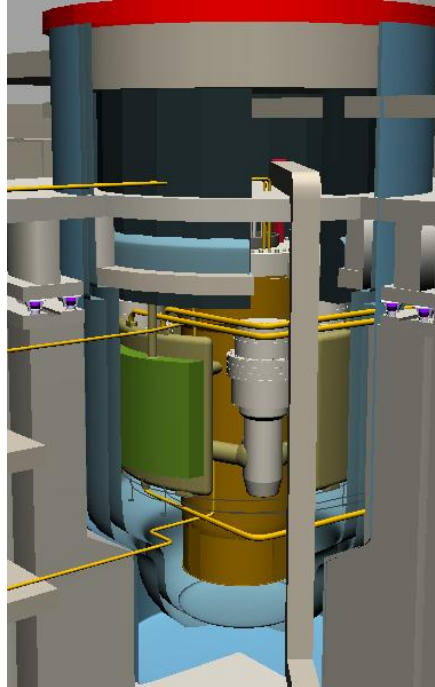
3D CAD Drawing of PEACER-300 MW(e)
